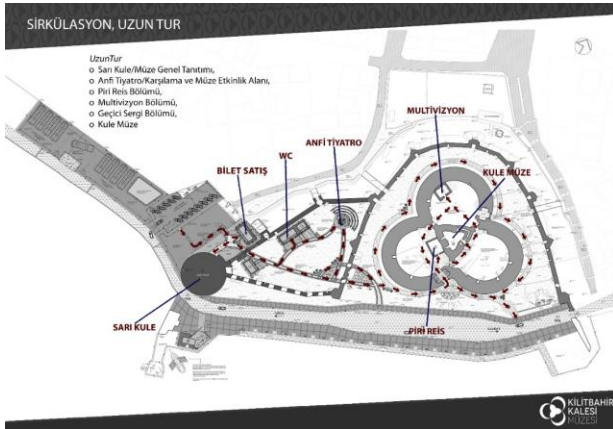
Kilitbahir Castle Site Plan-Long Tour Route, K. Duyar.
